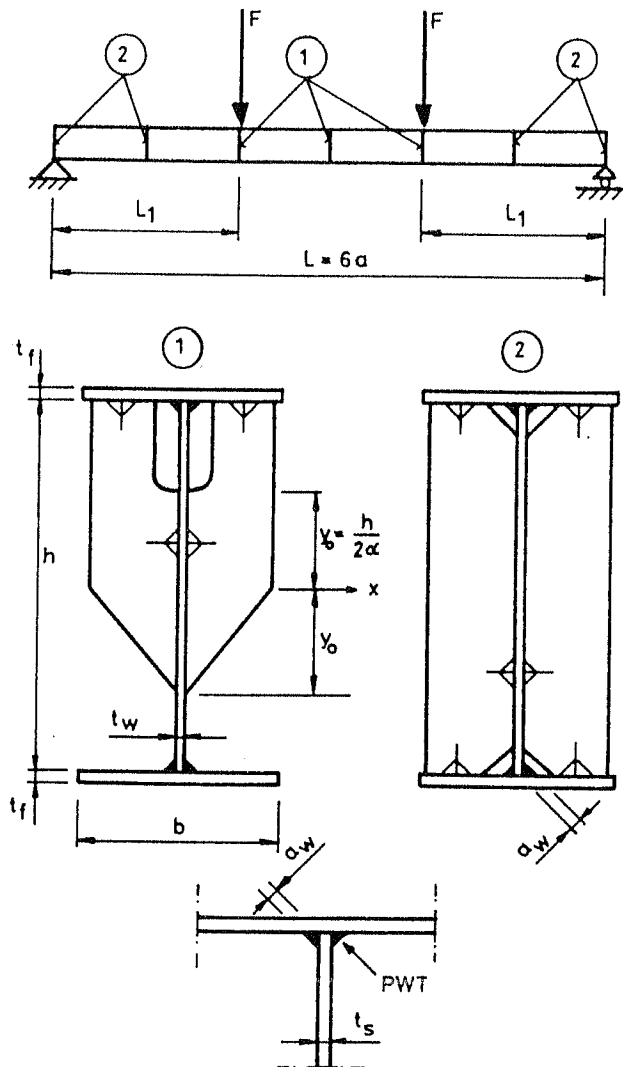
Welded I-beam with vertical stiffeners. Double fillet welds with (1) and without (2) PWT
